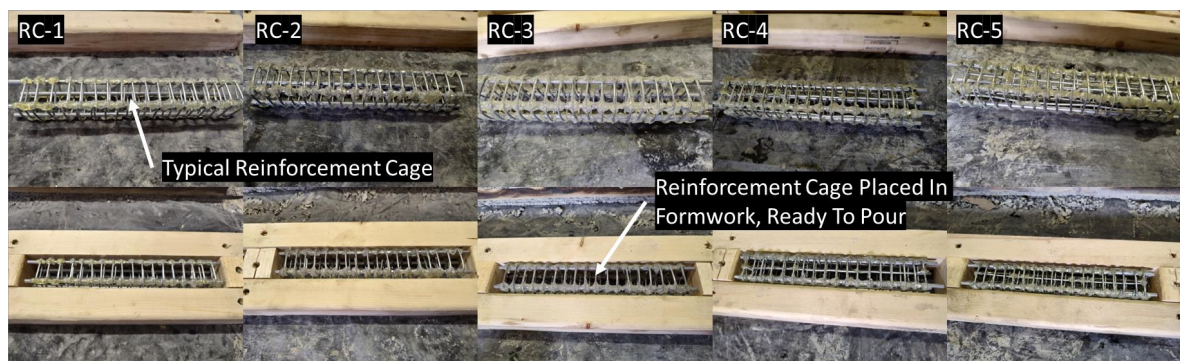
Beams RC-1 through RC-5 are shown before casting. Reinforcement cages, which are attached using hot melt adhesive, are shown out of the formwork as well as inside the formwork. The cages are approximately 248 mm (9.75 inches) long and the individual test beams after casting are 254 mm (10 inches) in length.
